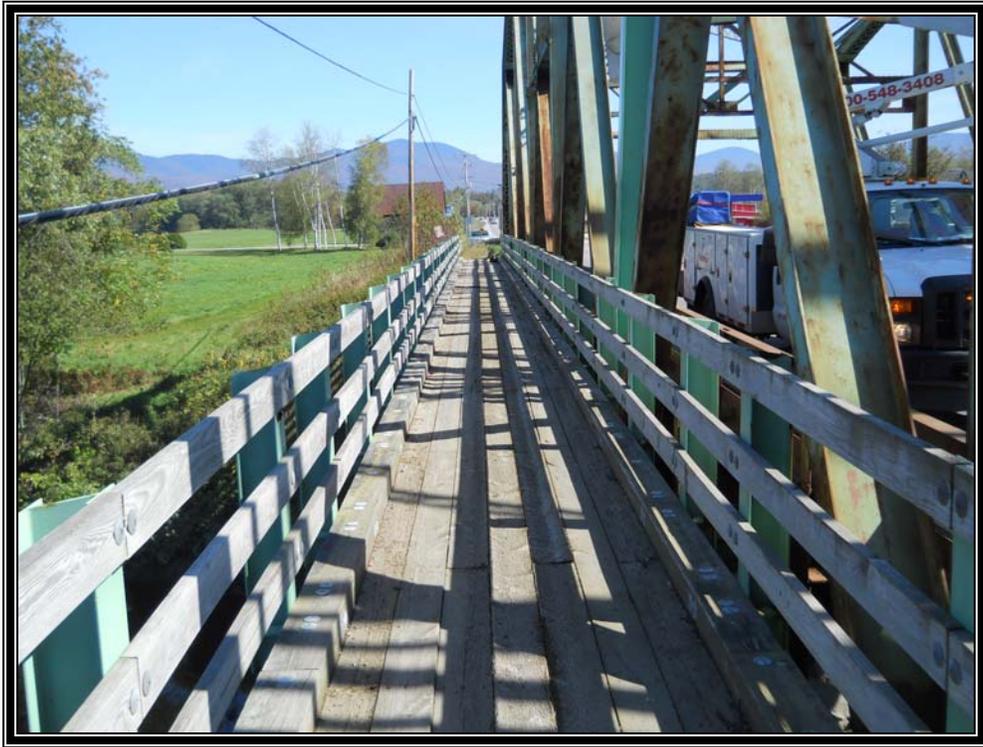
Cantilevered Sidewalk Weathered Running Boards
